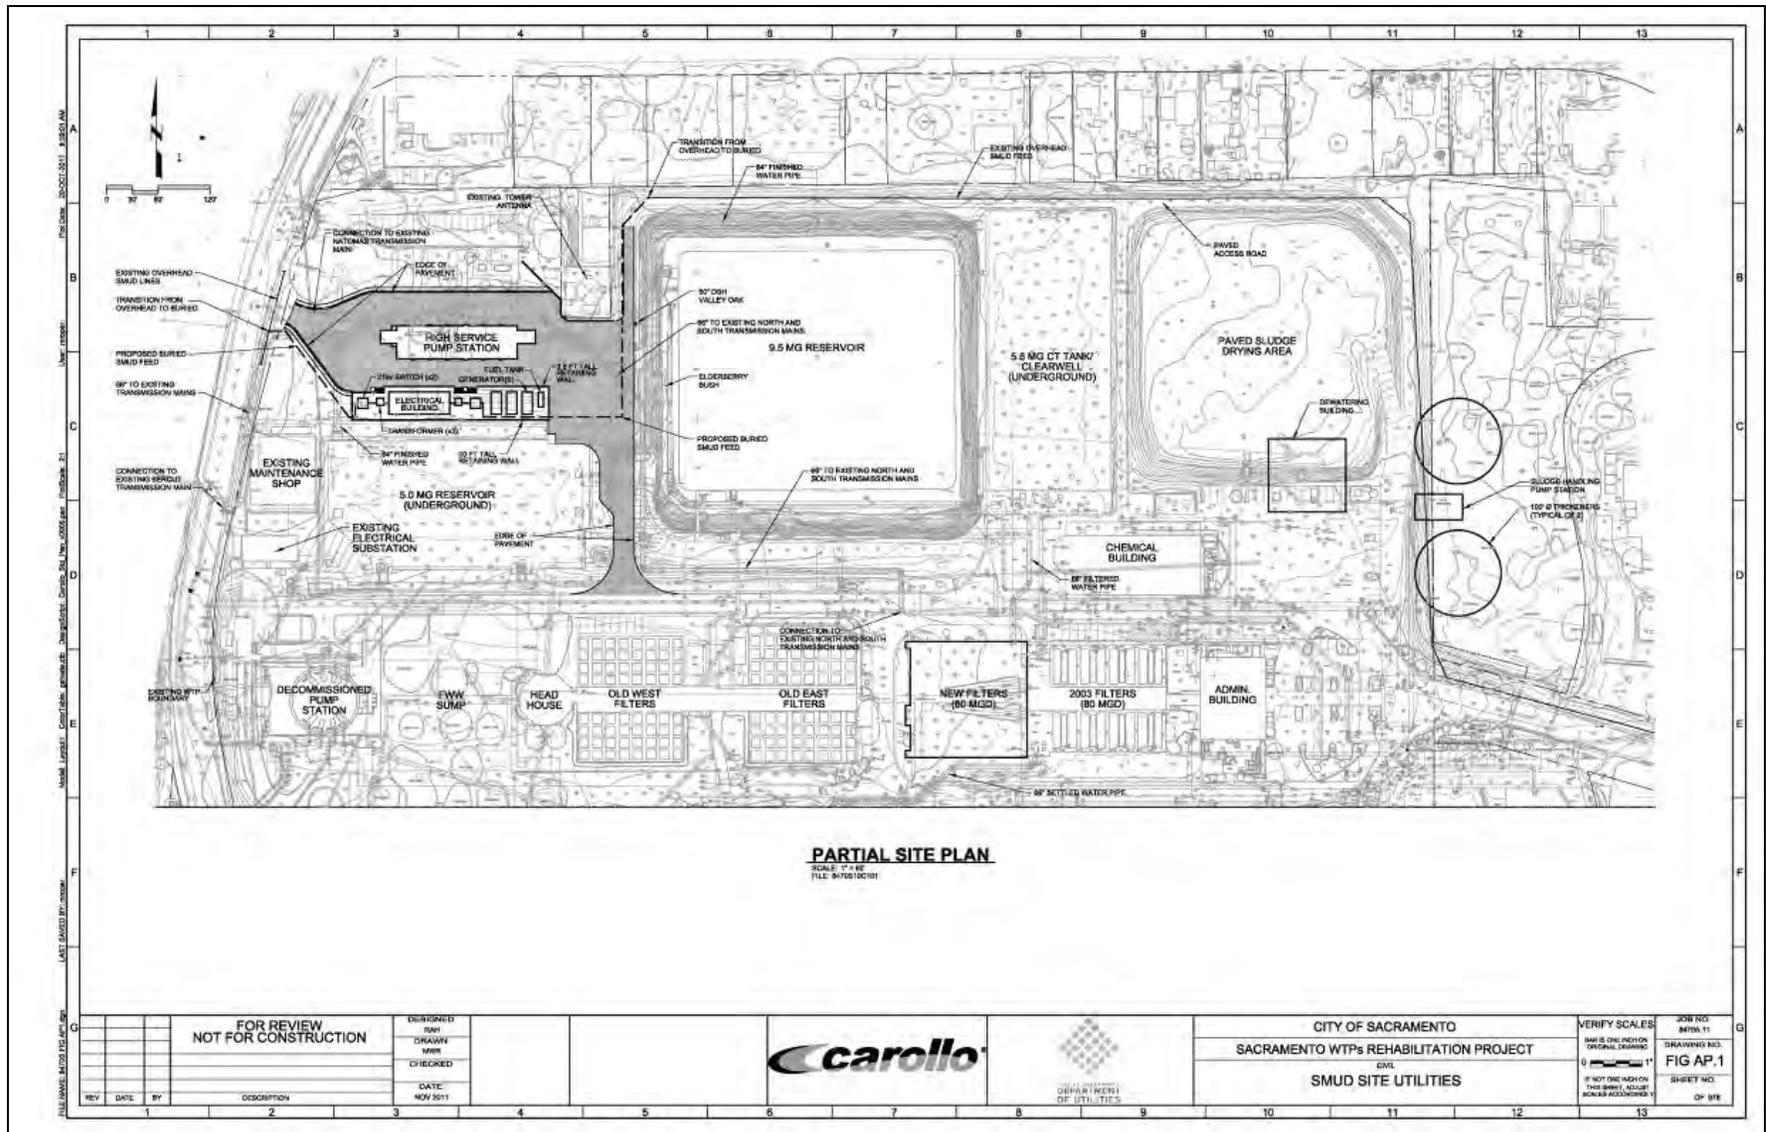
Site plan showing location of new pump station (left), filters (center) and solids handling facility, all outlined in black. Image courtesy of City of Sacramento.
